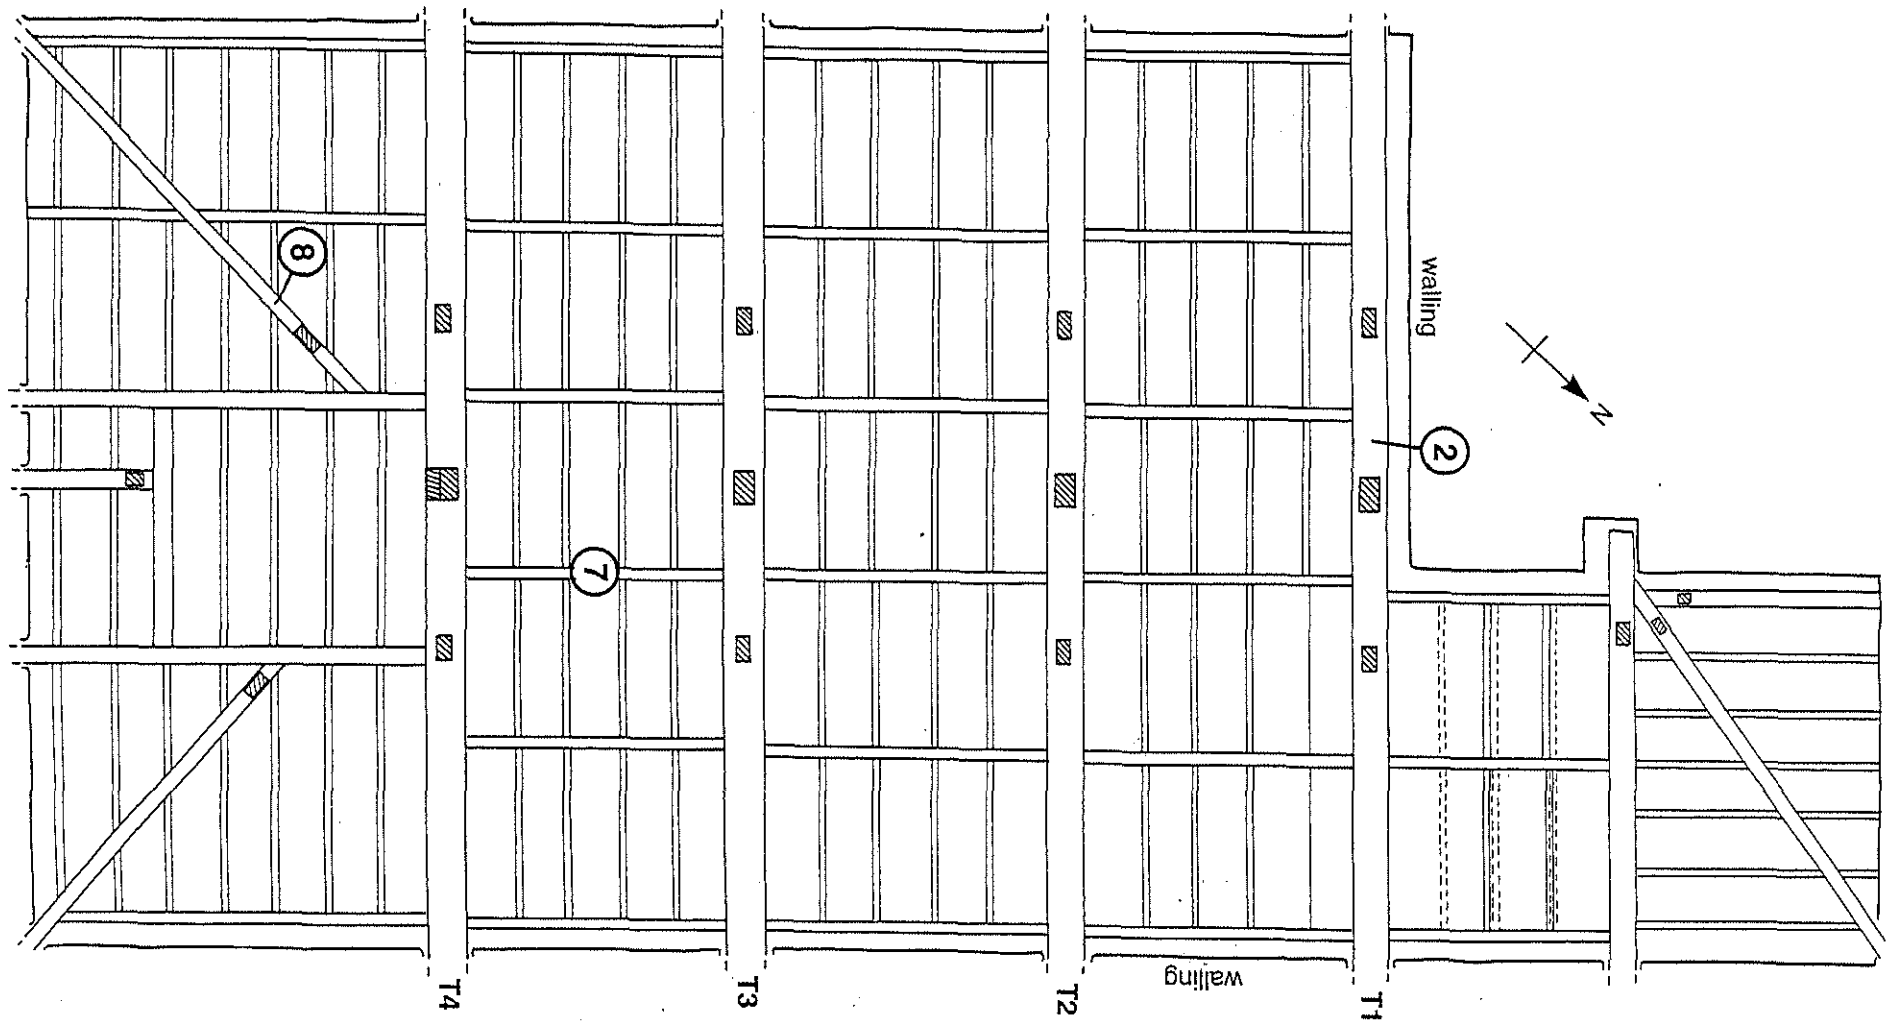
Bolsover Castle, east roof of Little Castle; plan of rafters to show position of timbers sampled
